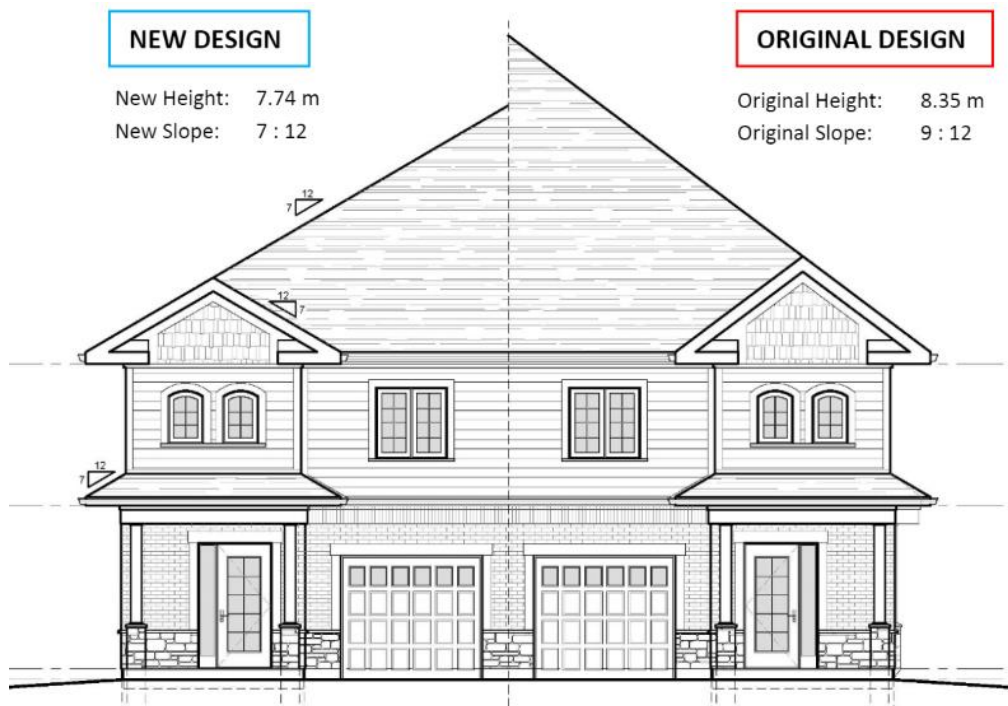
Ada Street Elevation Comparison of Original and Revised Building
